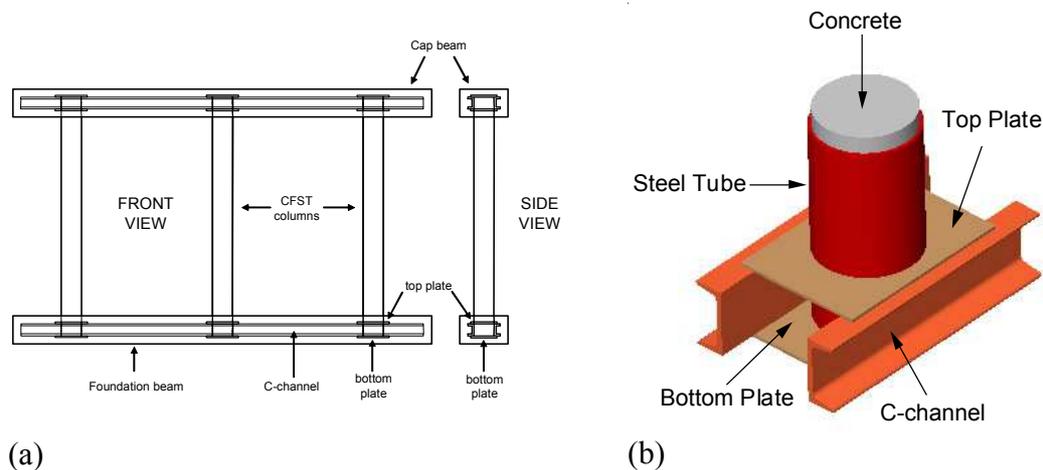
Multi-column pier-bent made up of CFST columns: (a) General description; (b) Details of column-to-foundation beam connection
